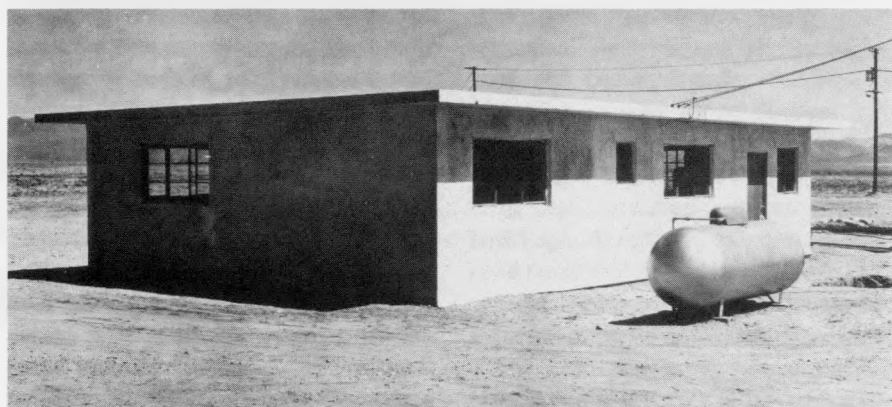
Reinforced precast concrete house before a nuclear explosion, Nevada Test Site.
